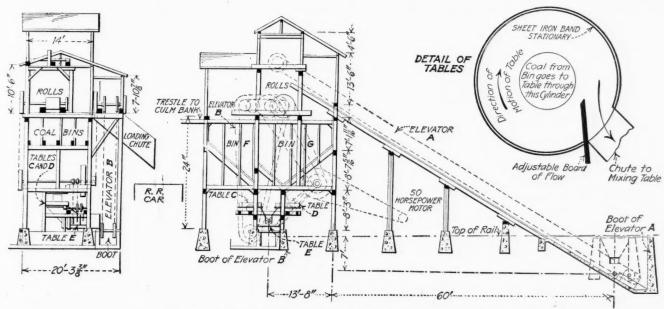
LONGITUDINAL AND CROSS-SECTIONAL VIEWS OF MIXING PLANT AT HAZLETON
